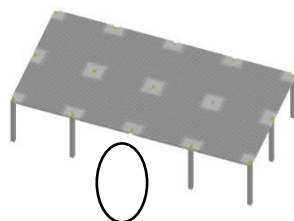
General view of the typical floor model with spans of 6.0 m. Circled in the centre is the zone where a column in the last row is missing ("failure" of the structure).
